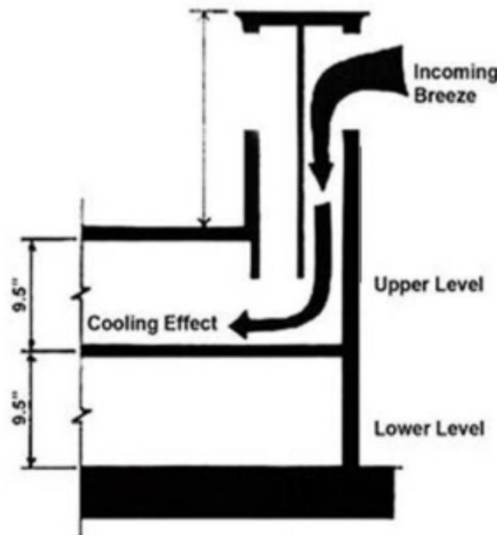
Cross section for wind tower (Alkhalidi, 2013).
